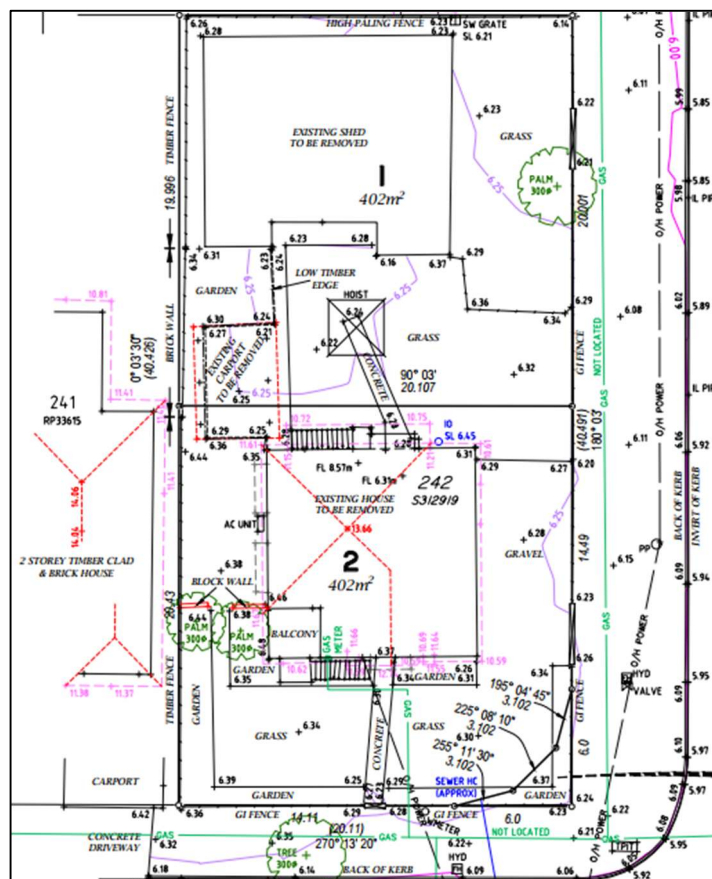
Subdivision Proposal Plan (Source: House Surveys)
